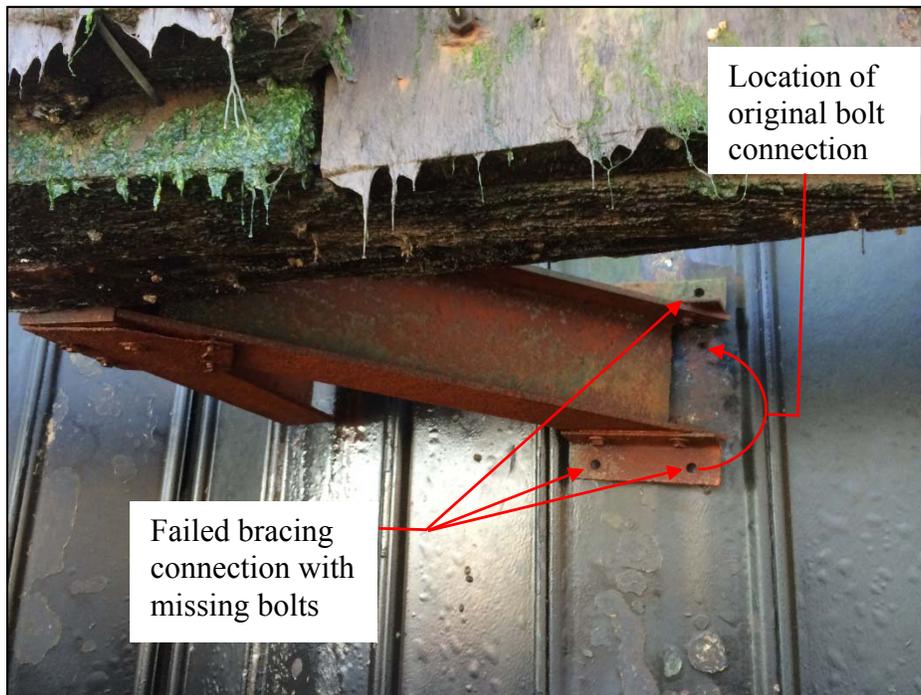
Low water bracing with missing bolted connections to sheet pile cell.
